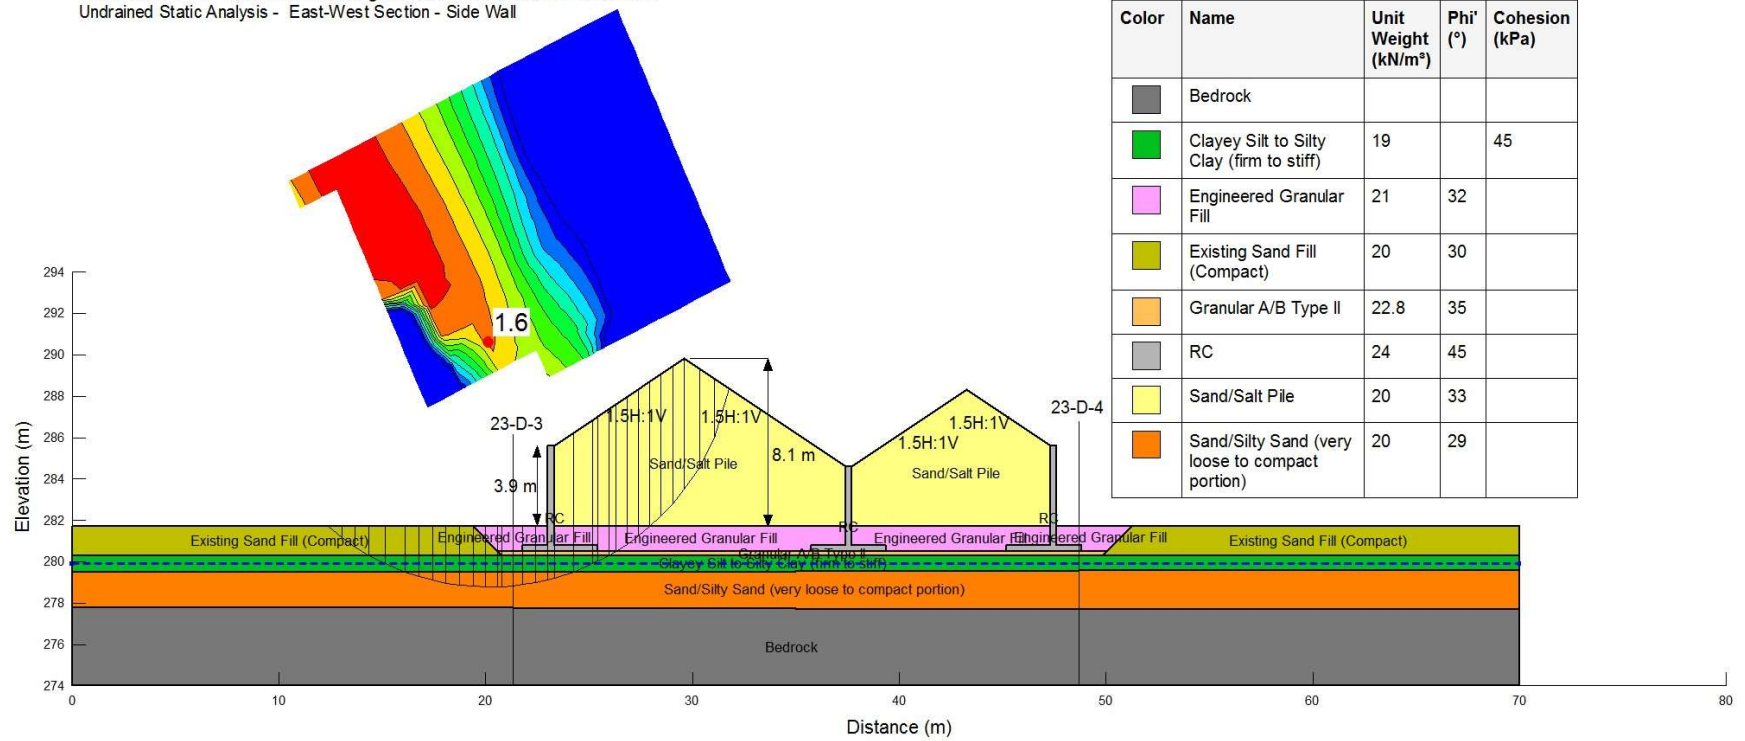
Slope stability analysis of new material storage building – E-W section, west side wall – undrained static analysis
